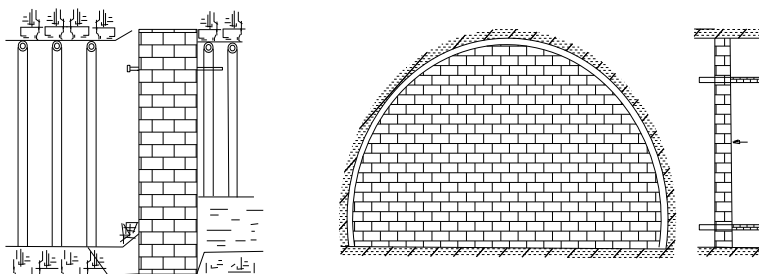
Diagram of a brick wall with a permanent seal wall
